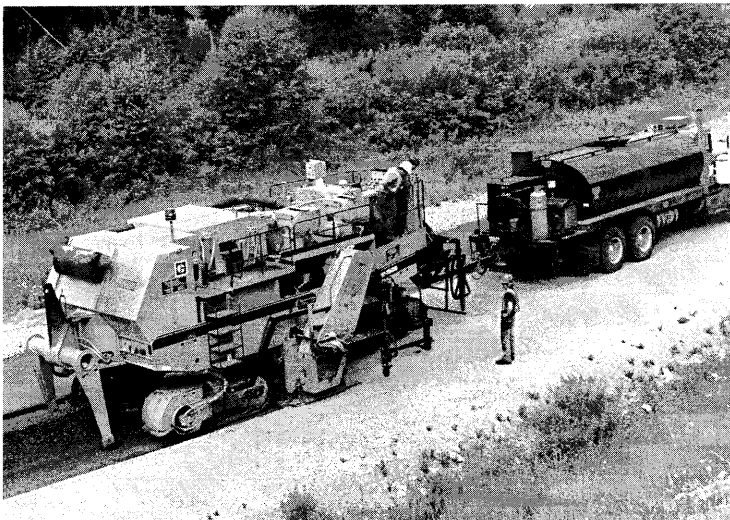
Traveling asphalt recycling plant. (Courtesy of Caterpillar Inc.)
